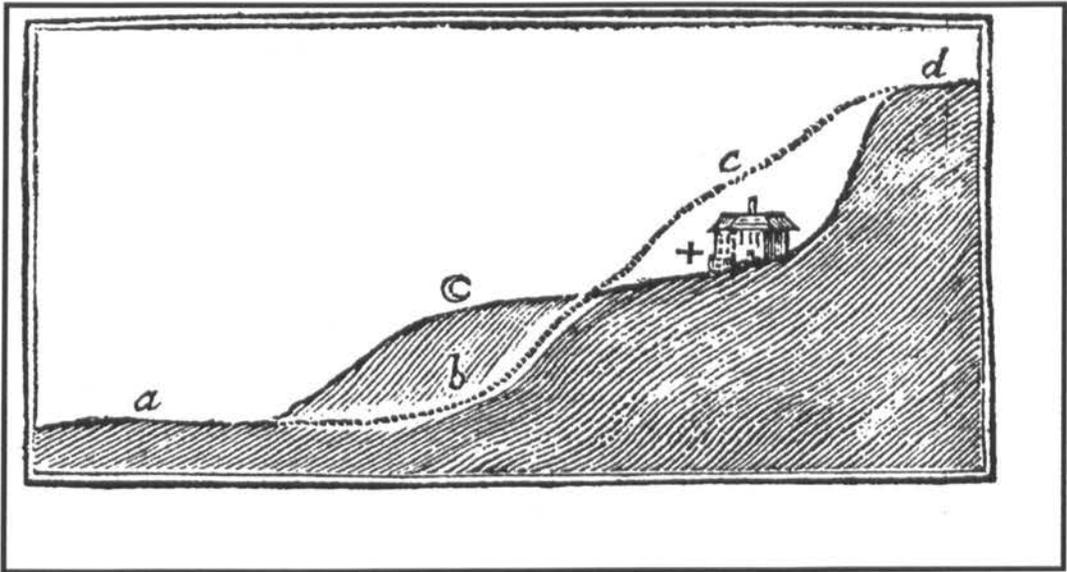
Cross-section through Seabrook Road, Hythe. (After A.G.Weeks & Partners Ltd.)
